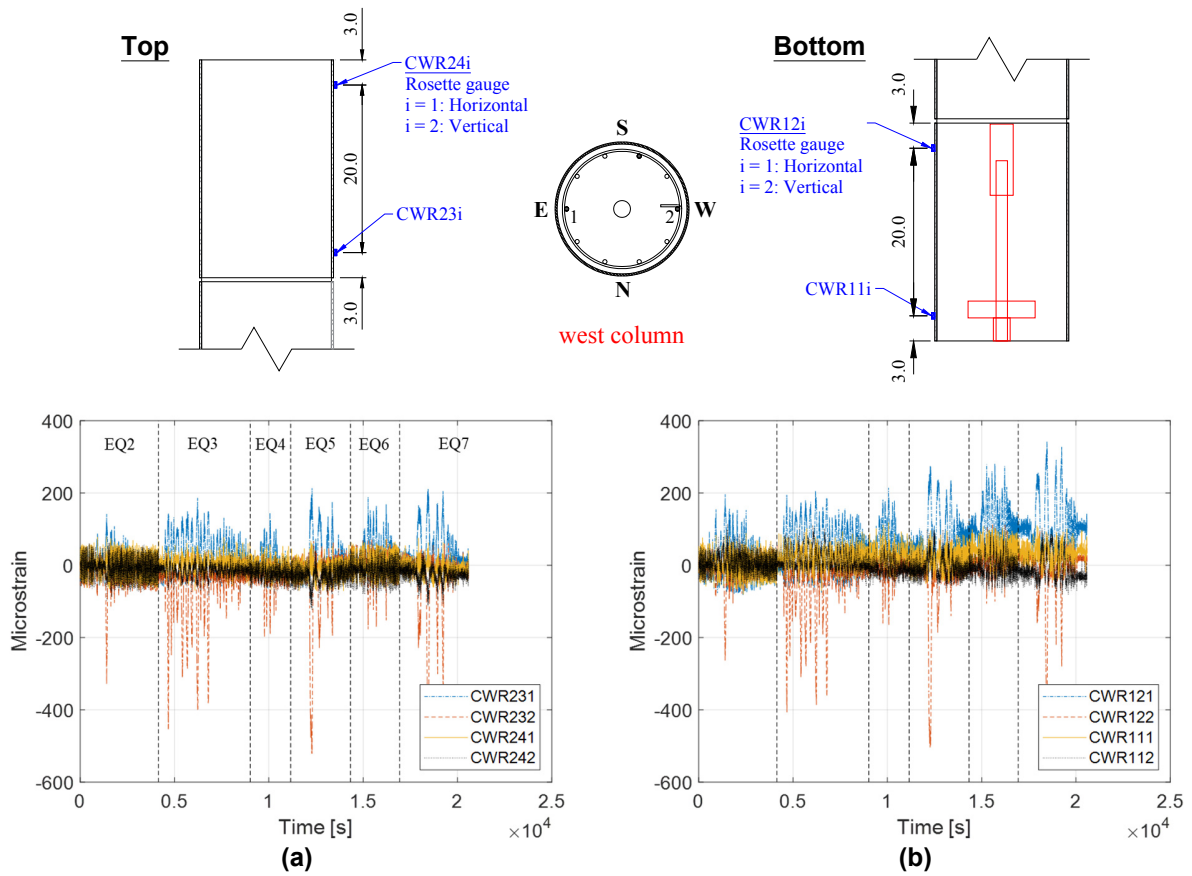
Strains of the embedded steel shell on (a) west column top, west side; and (b) west column bottom, east side.
